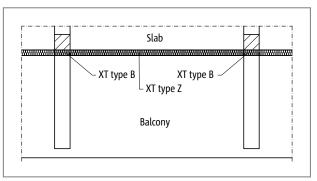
Schöck Isokorb® XT type B: Balcony construction with freely cantilevered downstand beams
